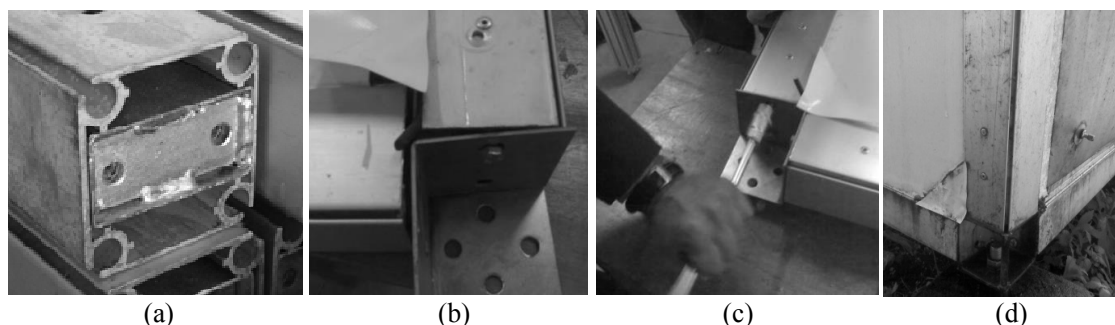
Membrane Test cell prototype details: a) aluminium frame profiles section, b) fixing the membrane on the frame, c) fixing the steel joint connection to the frames on corners; and d) profile corner with stretched Polyester/PVC membrane and inflatable PVC foil.
